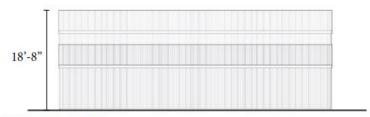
Existing Agricultural Building To Be Used for Manufacturing and Processing
